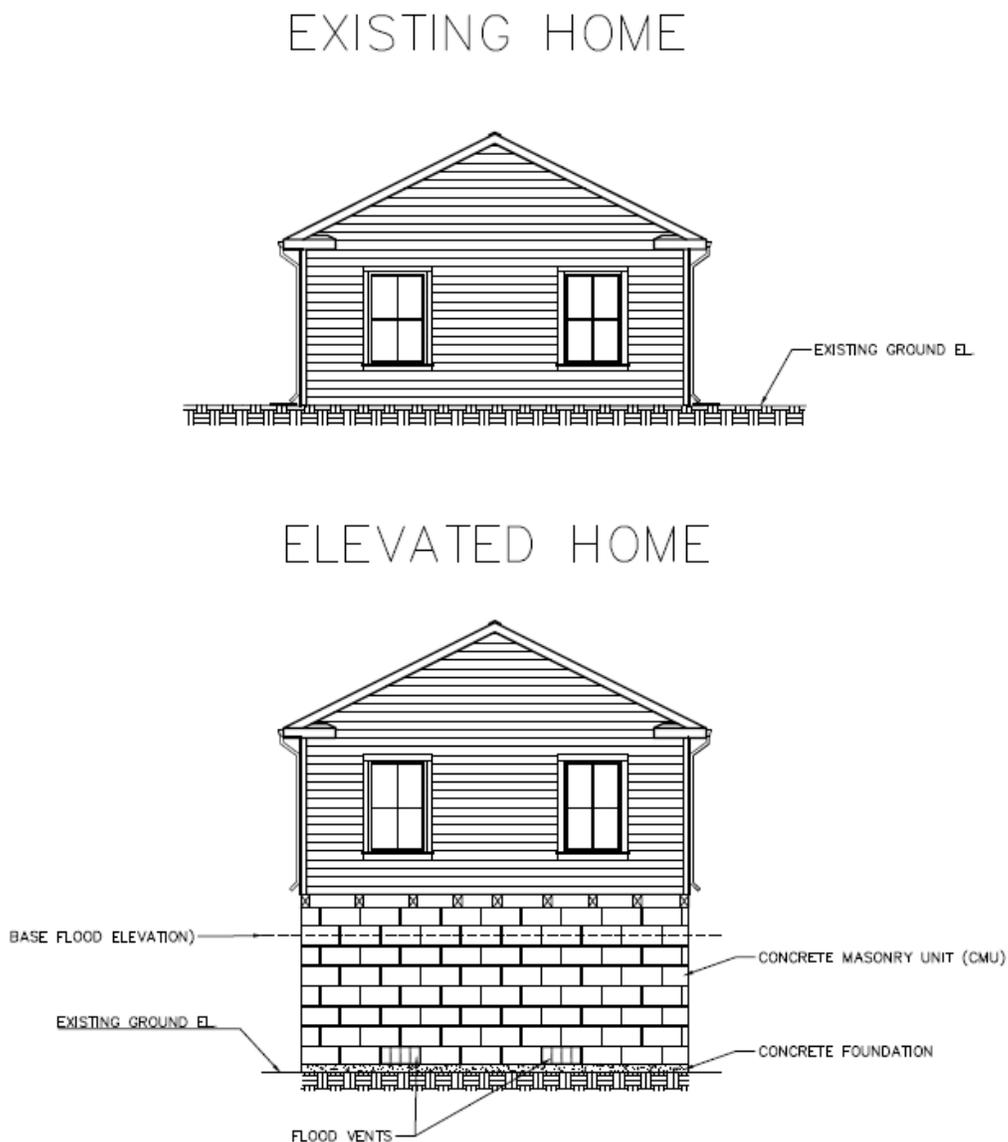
Extended Foundation Concept Drawing (Courtesy of USACE-NAP)
